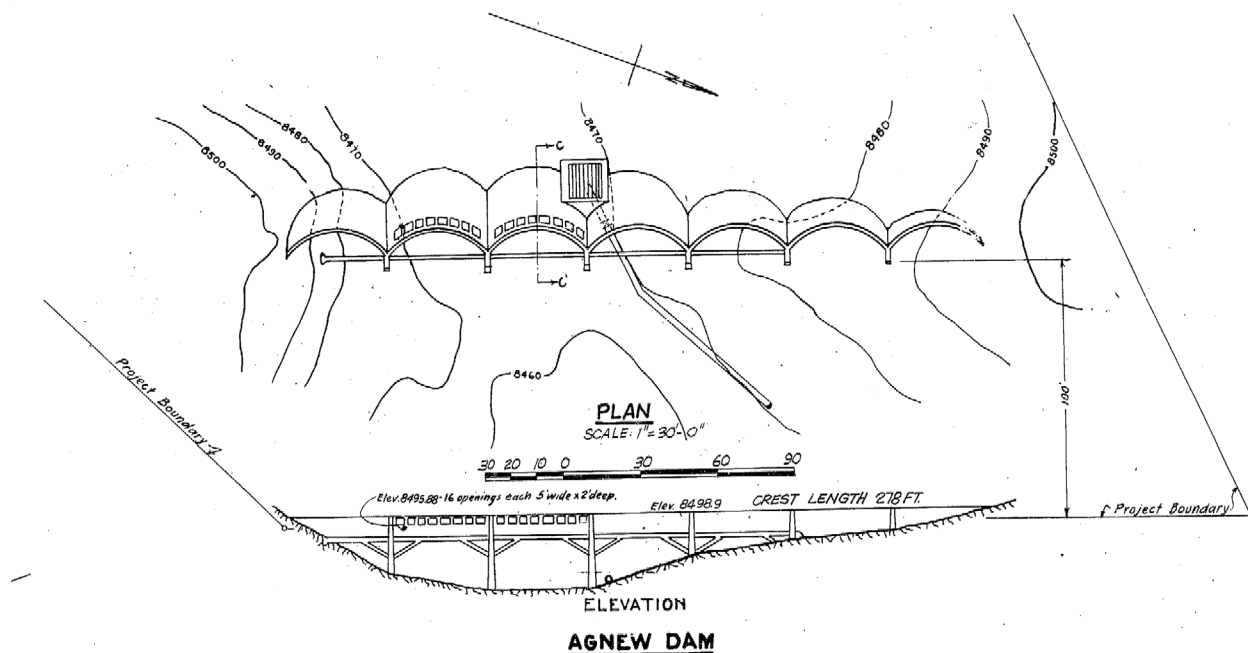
Exhibit F engineering drawing showing Agnew Dam elevations and 10-foot contours in the vicinity of the dam.
